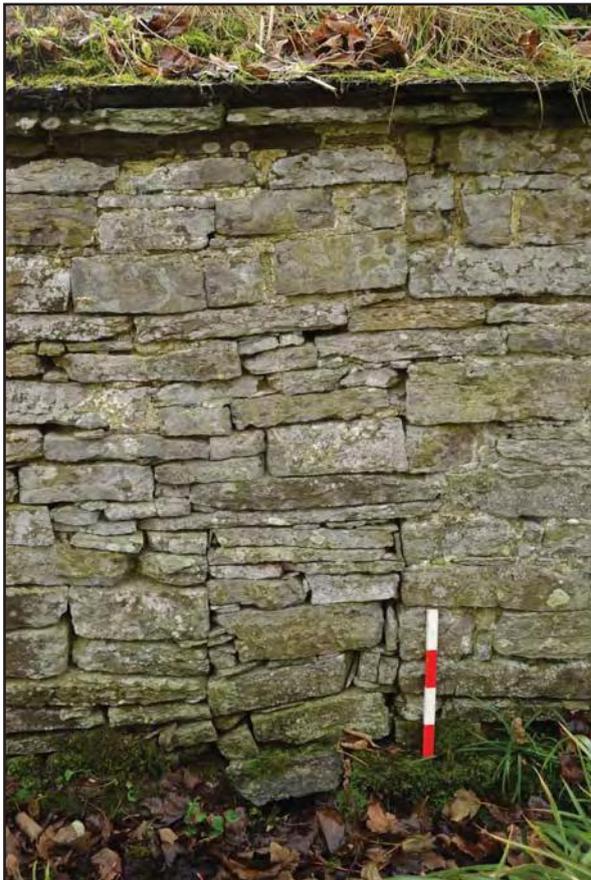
Change of build B1.1.001/005 and blocked aperture B1.1.006/007, looking south.
